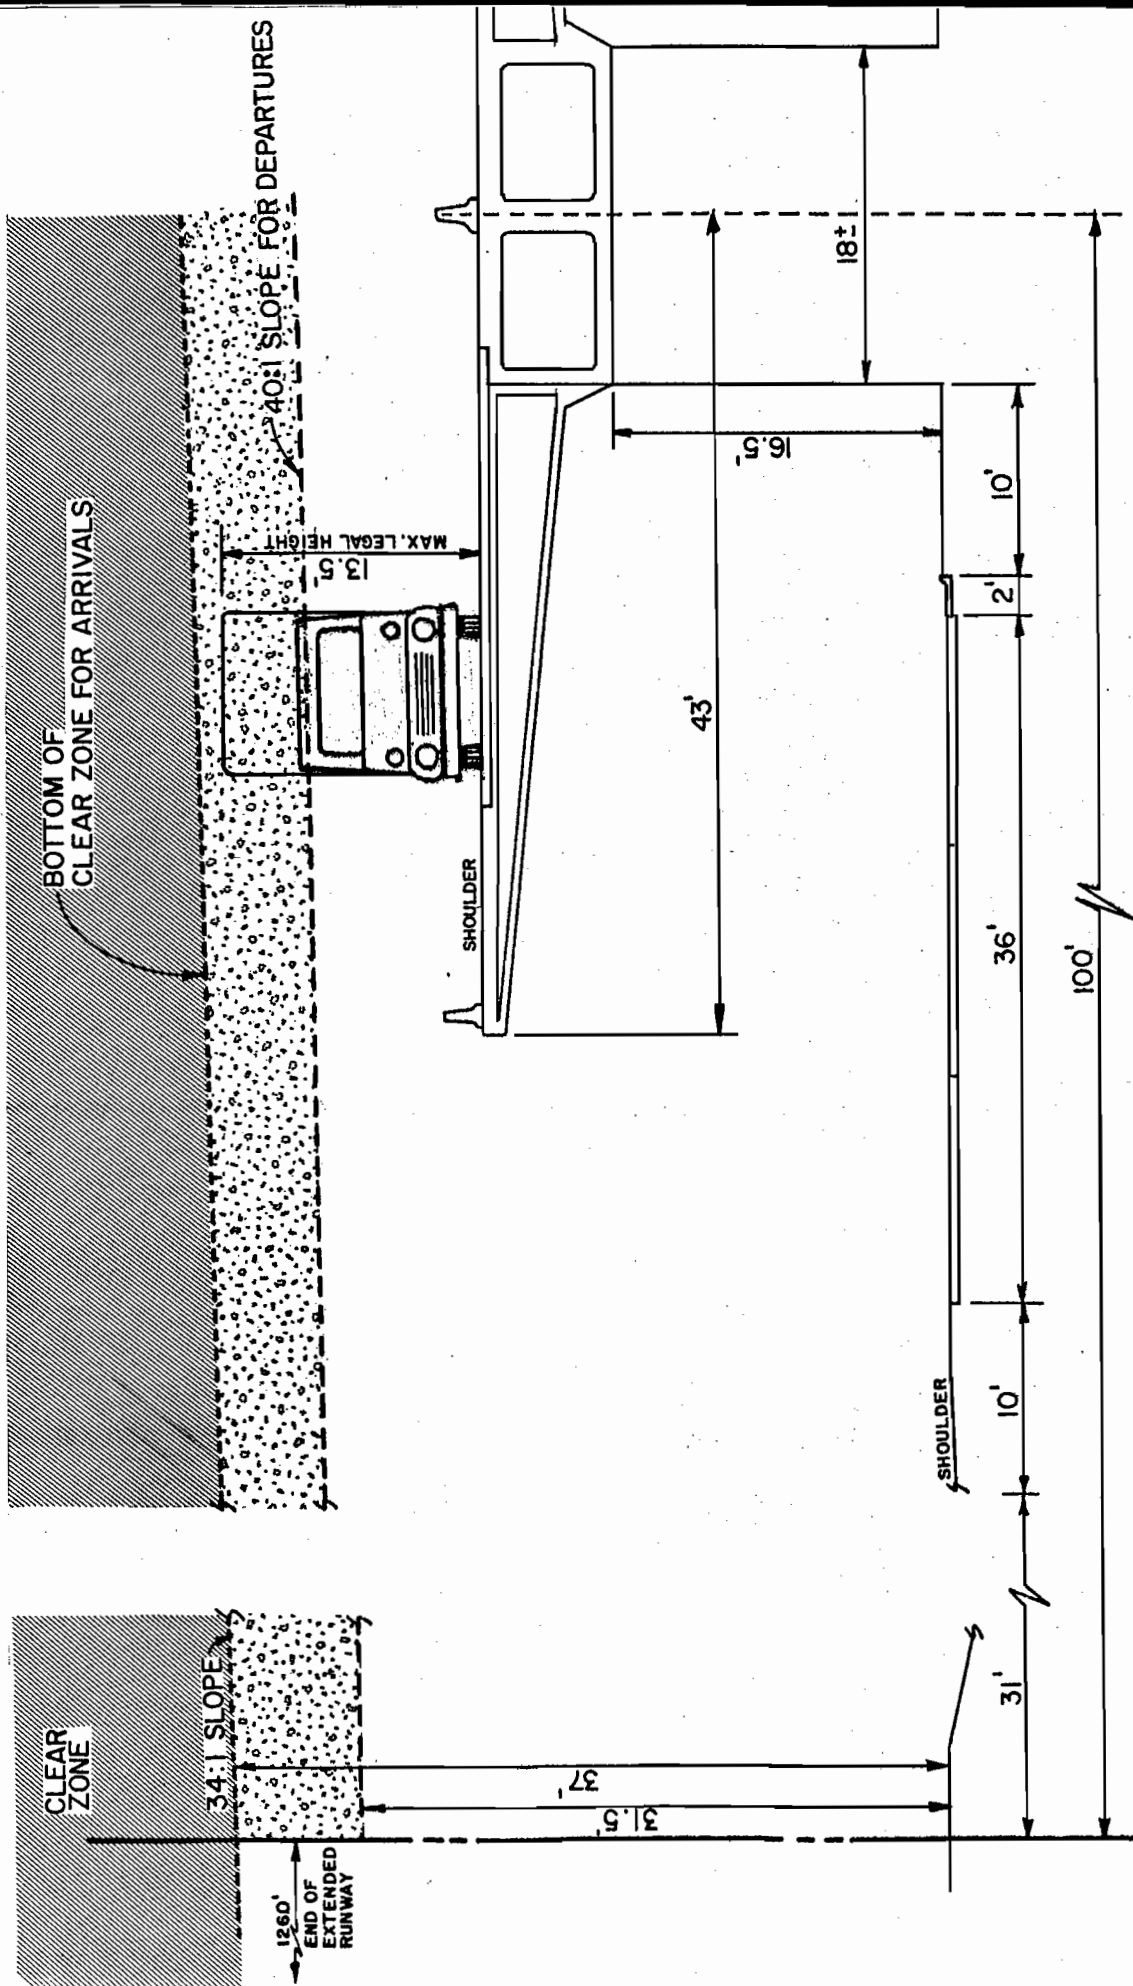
ELEVATED FREEWAY TYPICAL SECTIONS
